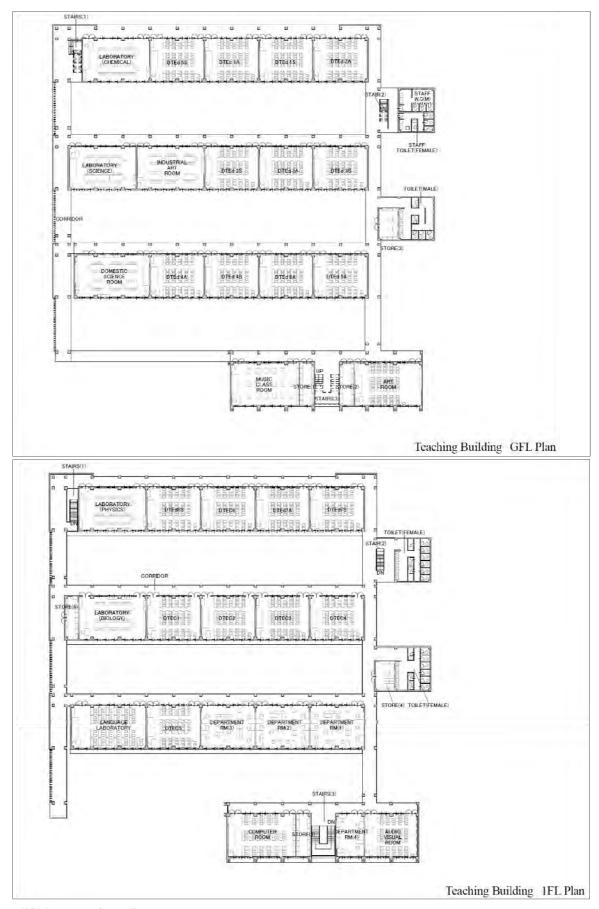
Plan of Teaching Building (Ground Floor & 1st Floor)
